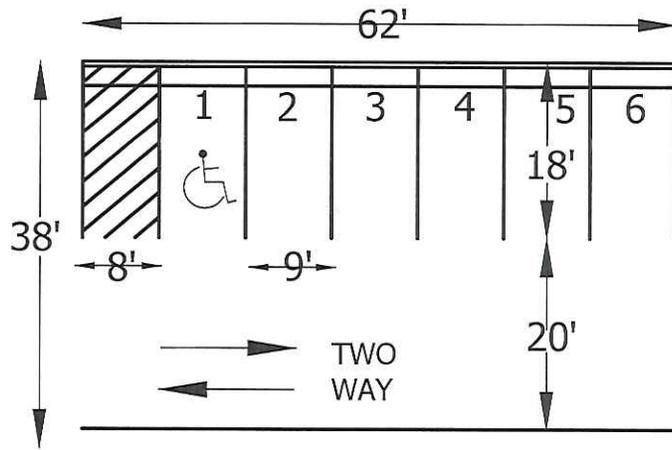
A parking lot with six (6) 90-degree parking spaces if exempt from the Parking Lot Landscaping Requirements.
